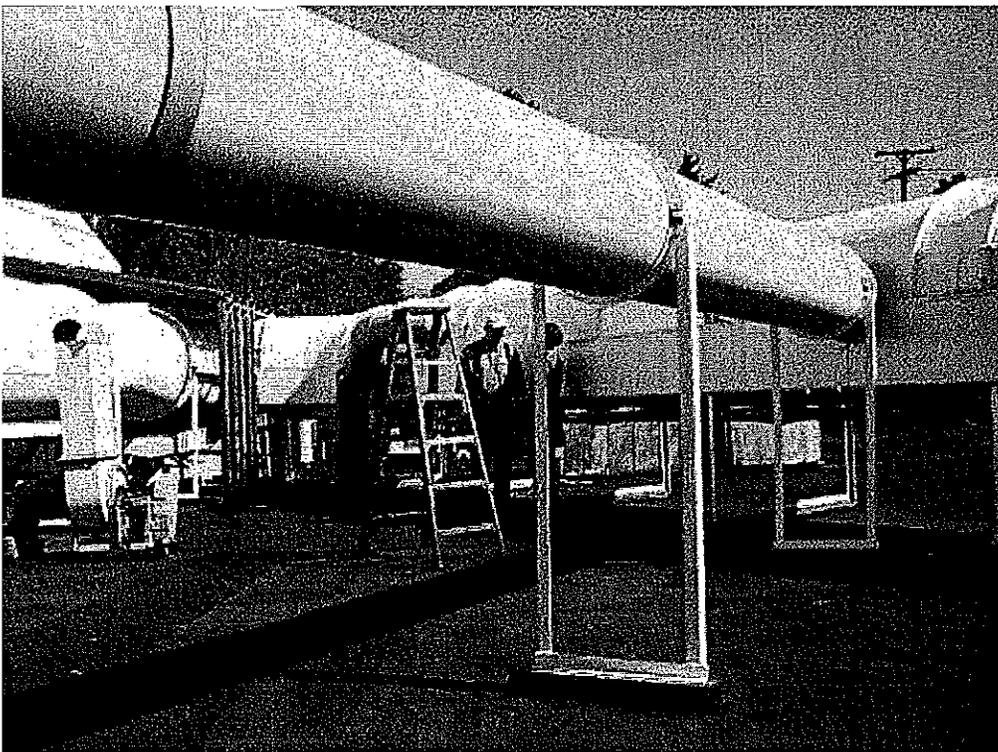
(Photo 4) : Looking N, at 54 inch diam. ductwork (background), to be replaced with twin 24 inch ducts.
